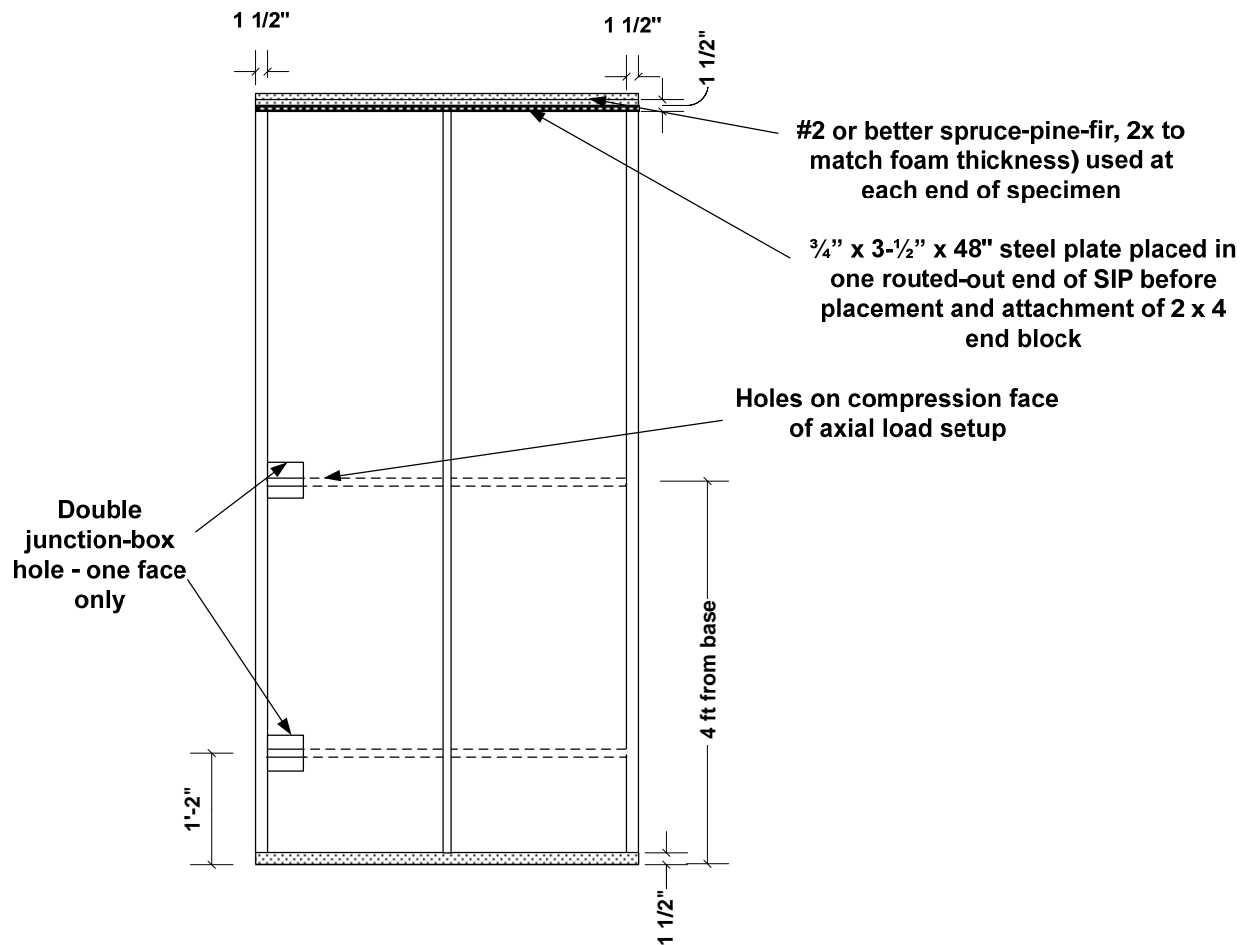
AXIAL (COMPRESSION) LOAD TEST SPECIMEN AND ASSEMBLY
